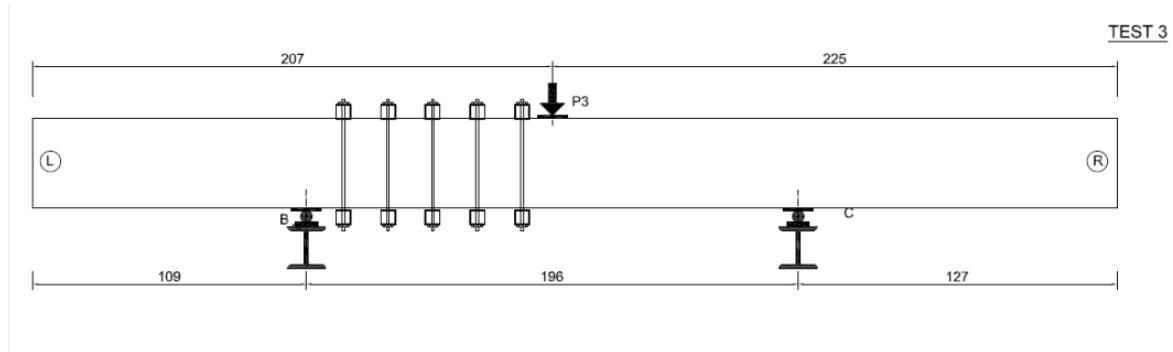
Beam 1 Test 3 Configuration (dimensions in inches).
